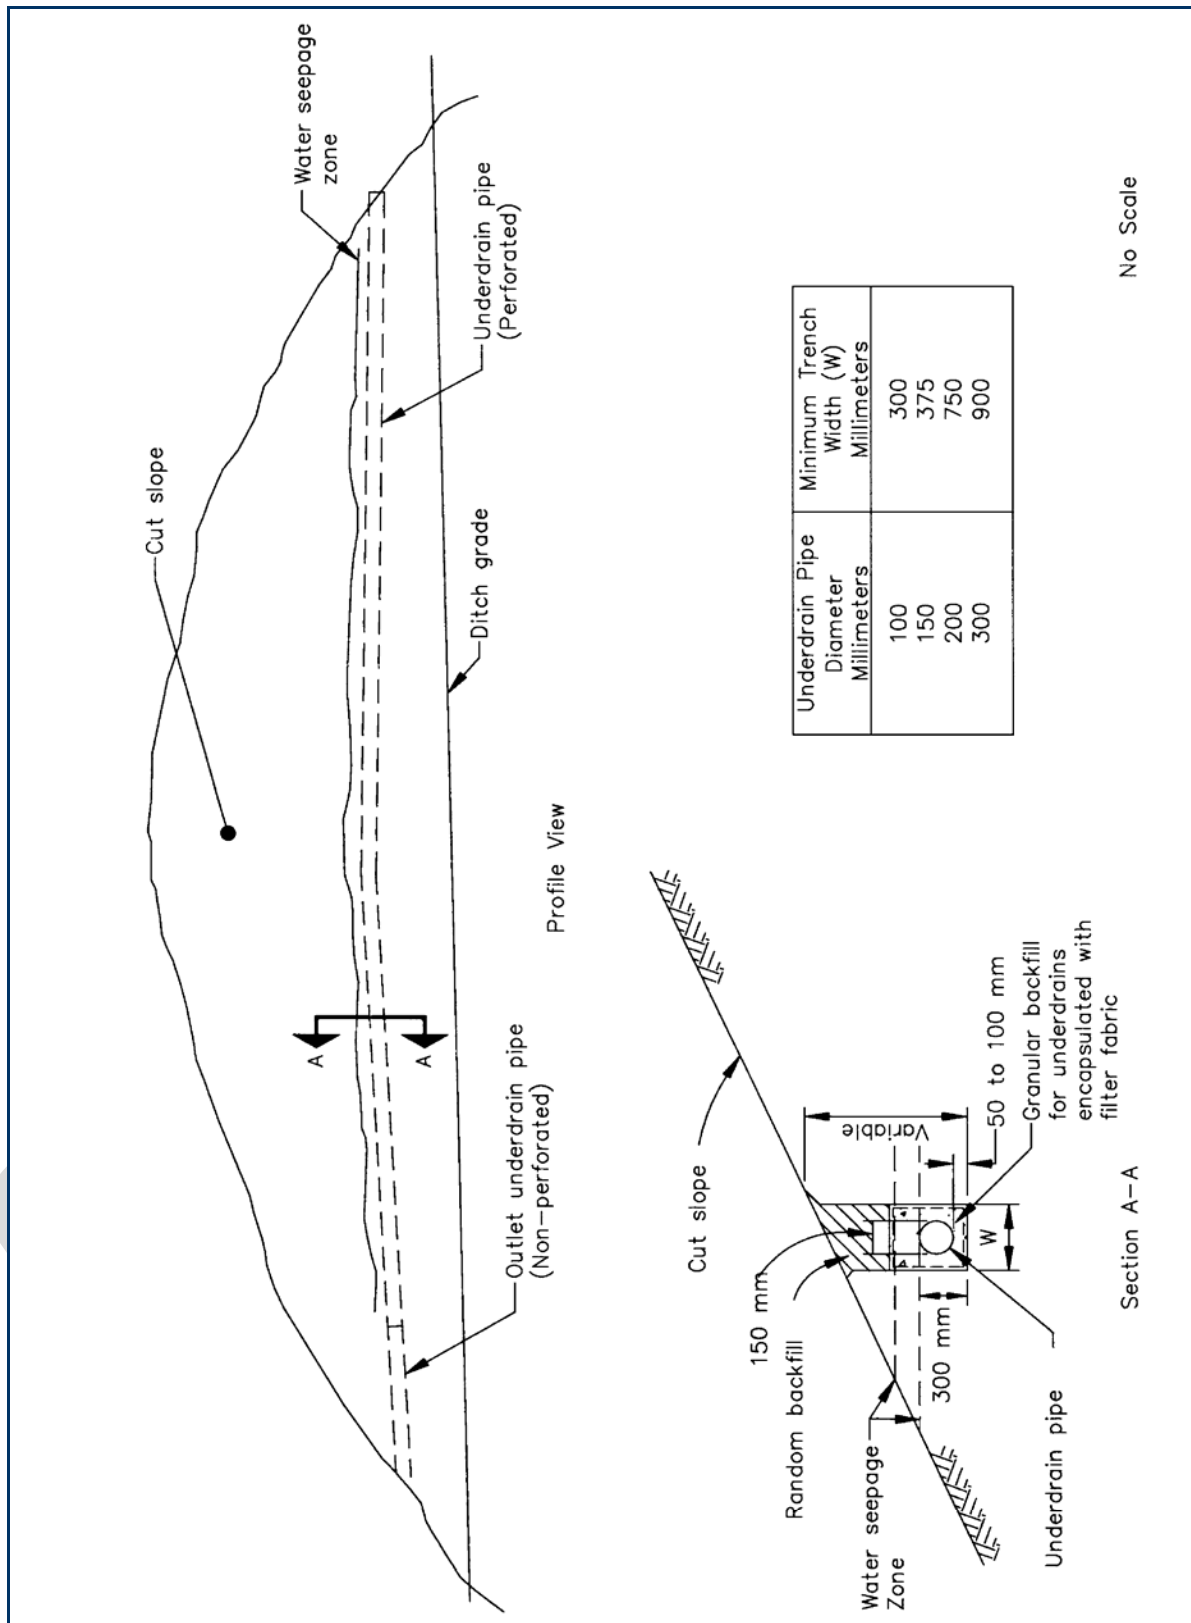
E TYPICAL UNDERDRAIN INSTALLATION FOR BACKSLOPE (Metric)
